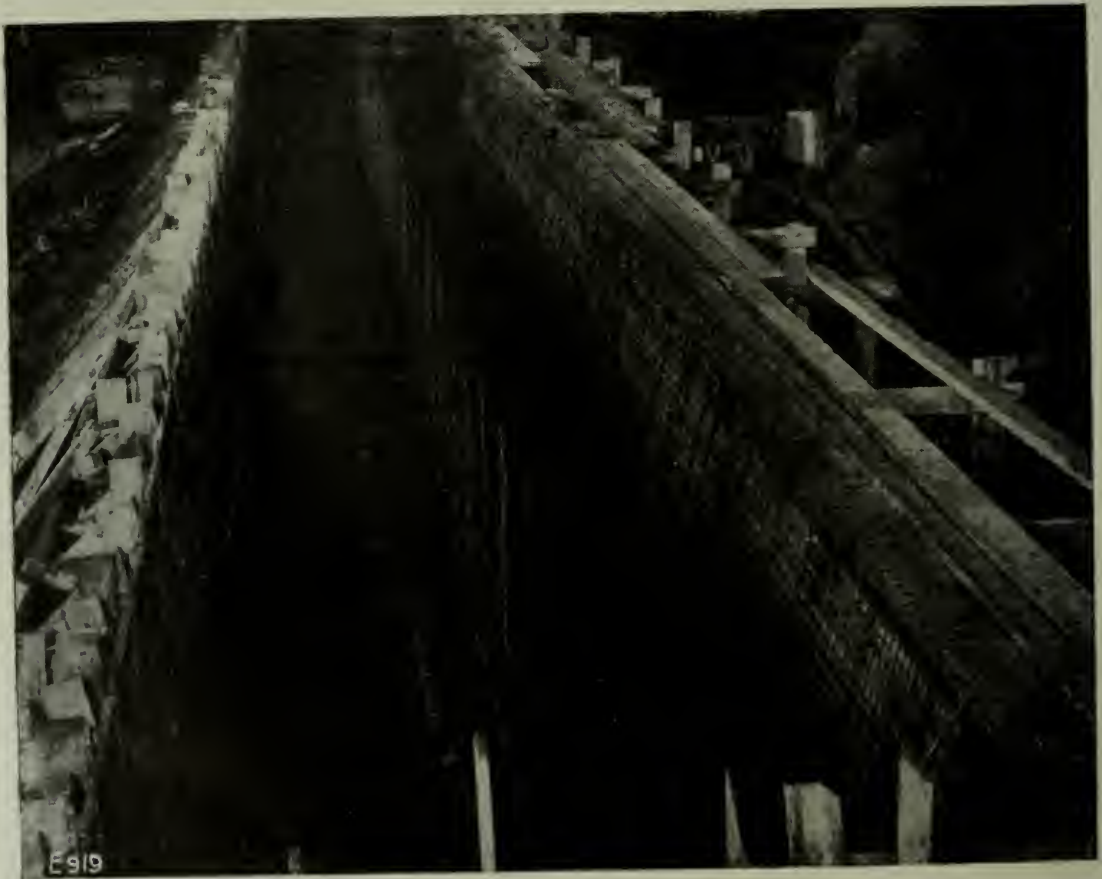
REINFORCEMENT OF PONTOON. (See p. 735.)
